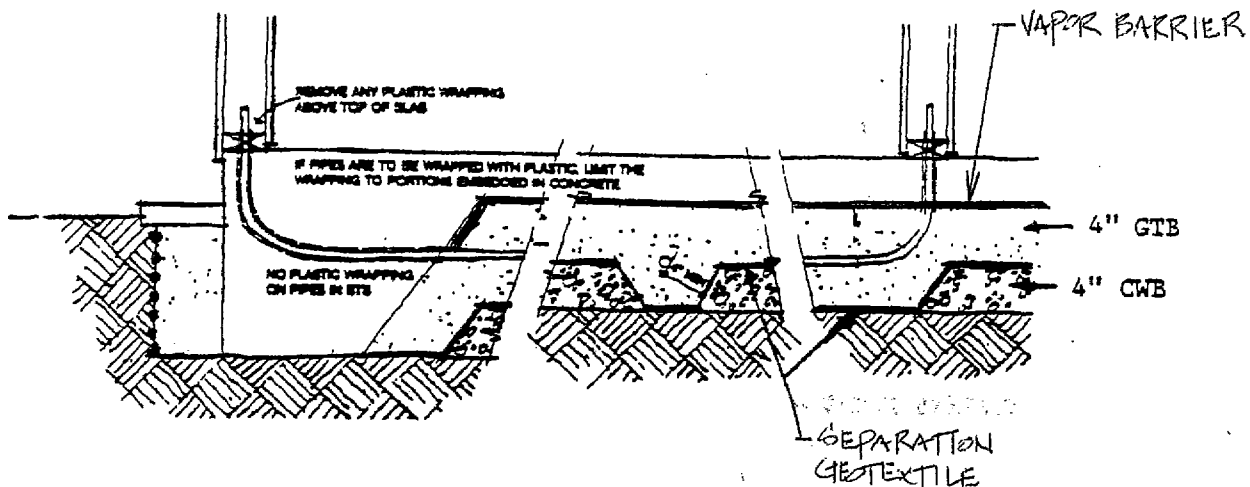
TYP. GTB DETAILS AT SUBSLAB CONDUITS/WATER PIPING
